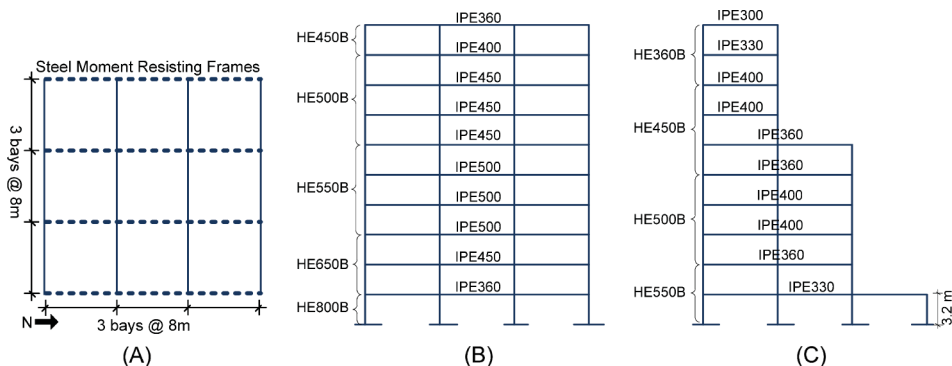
Building designs: (a) plan; (b) regular building profile; (c) irregular building profile.
